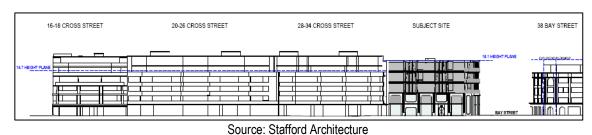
Streetscape Elevation Showing Subject Site and Nearby Approved Developments
